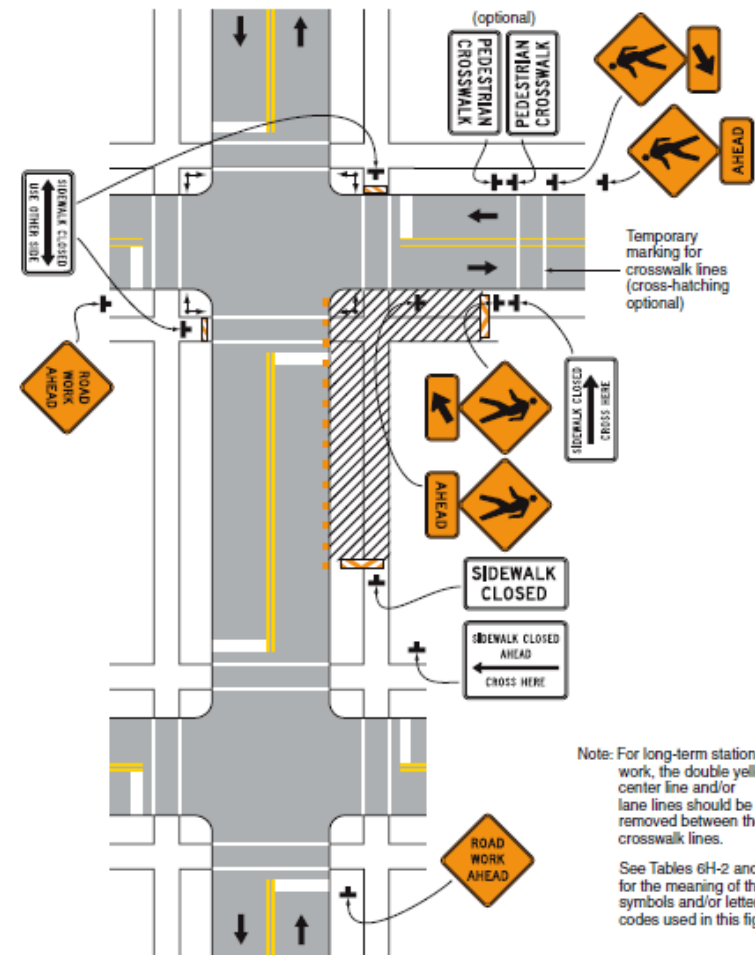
H-28. Sidewalk Detour or Diversion (TA-28)
